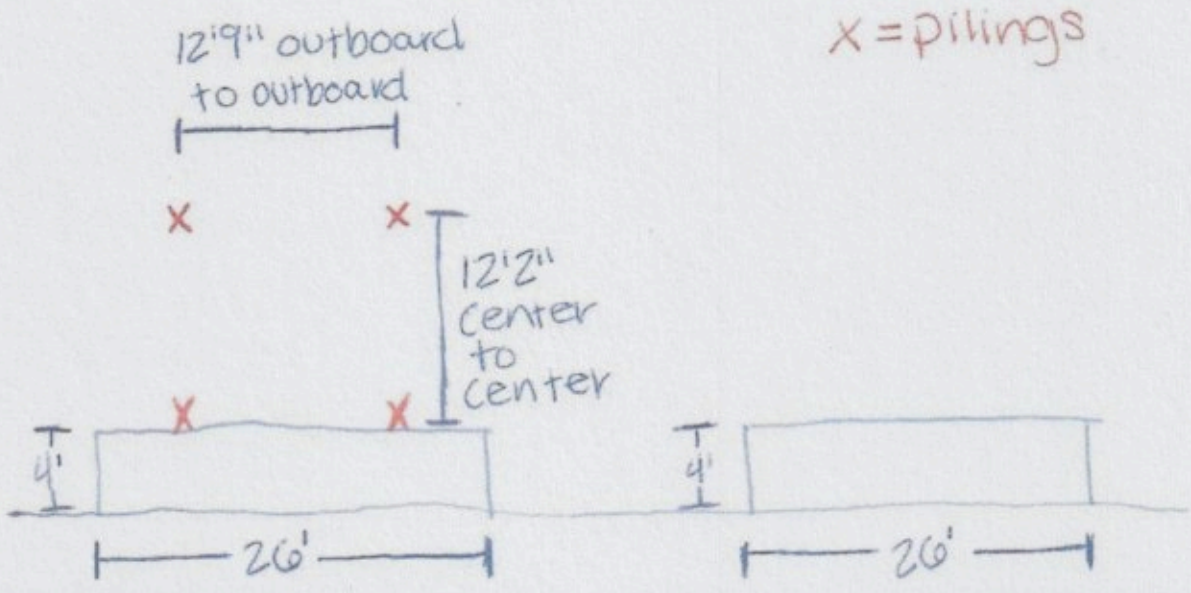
Plan view and cross-section sketches of proposed project. Sketches for permit application purposes only.
